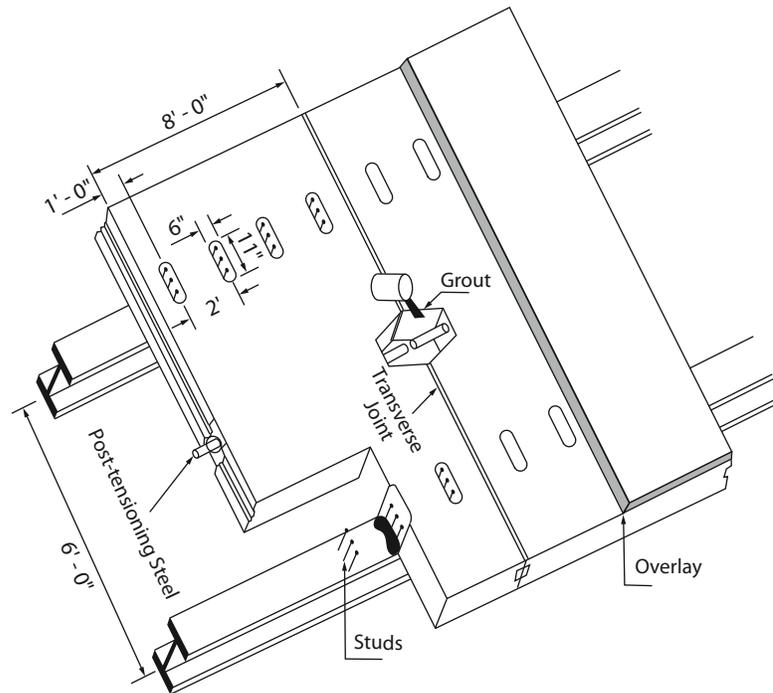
Typical layout of the full-depth precast bridge deck system.
